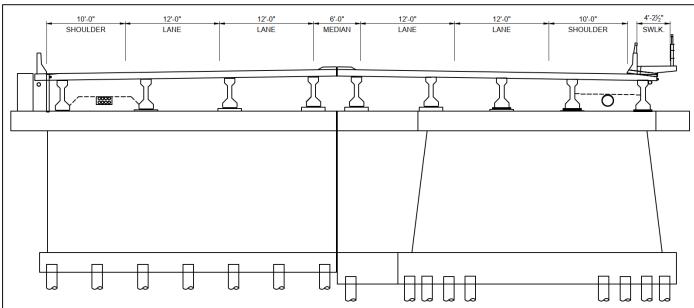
, Existing Bridge Typical Section across the Rio Grande
